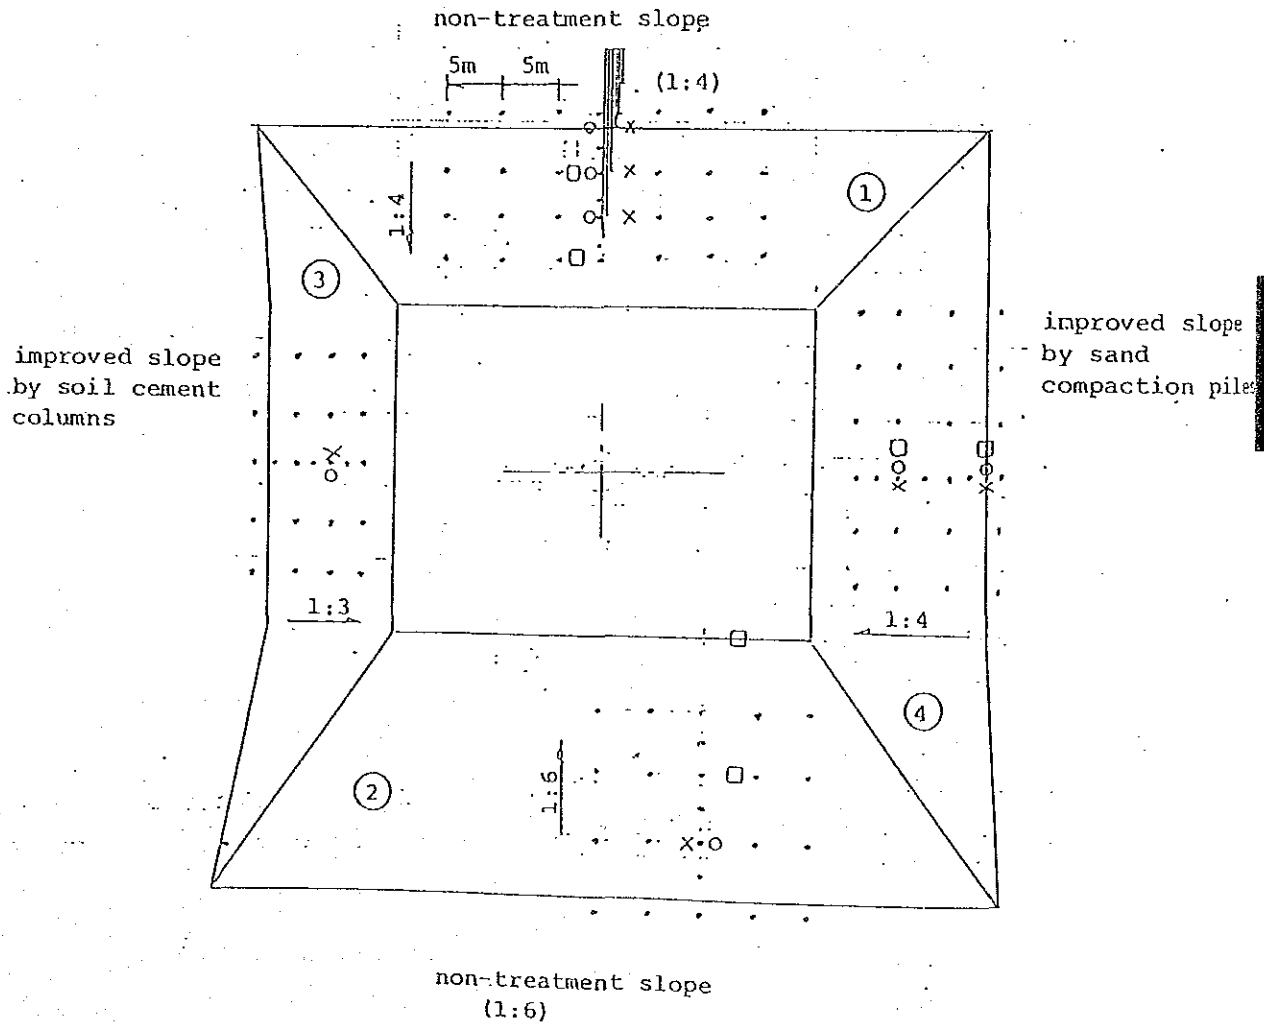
Arrangement Plan of Monitoring Instruments
